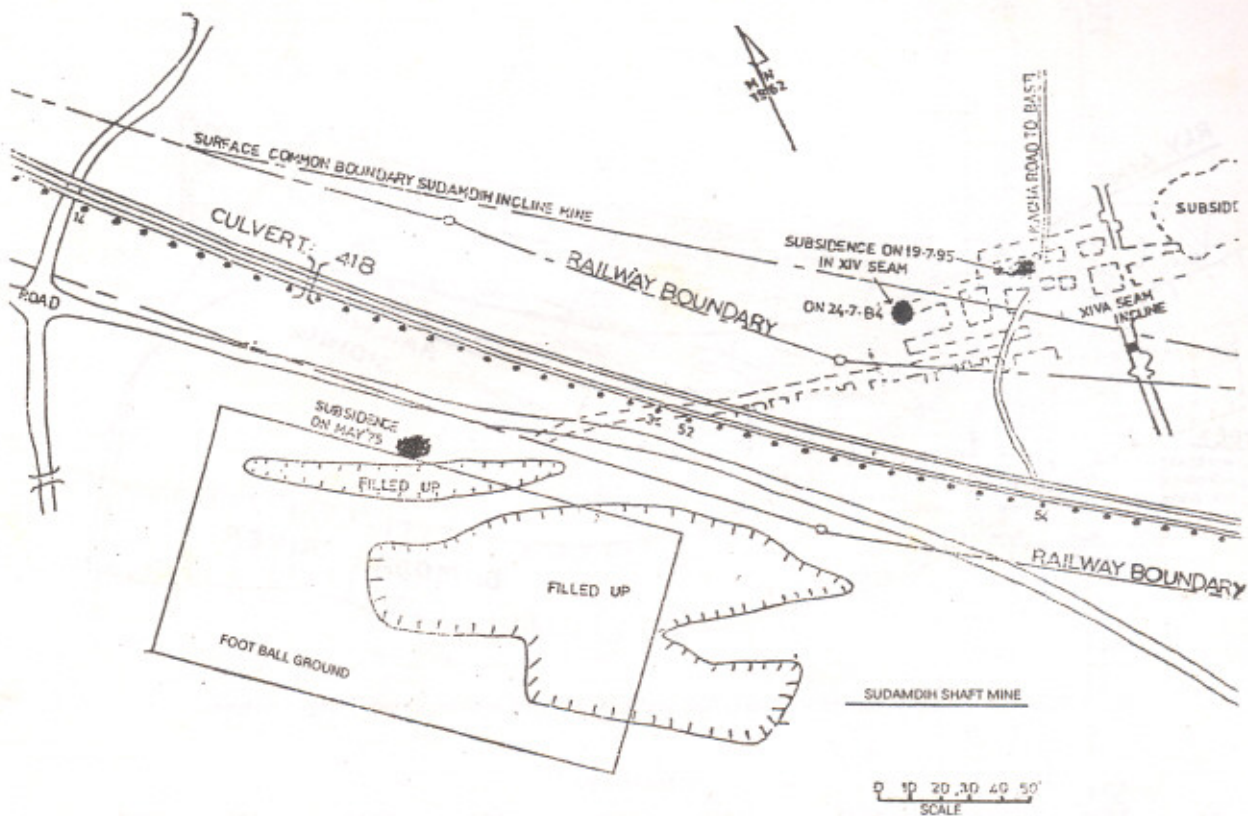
Part Surface Plan showing Monitoring Stations along Railway Line, Roads, Foot Ball Ground etc.
